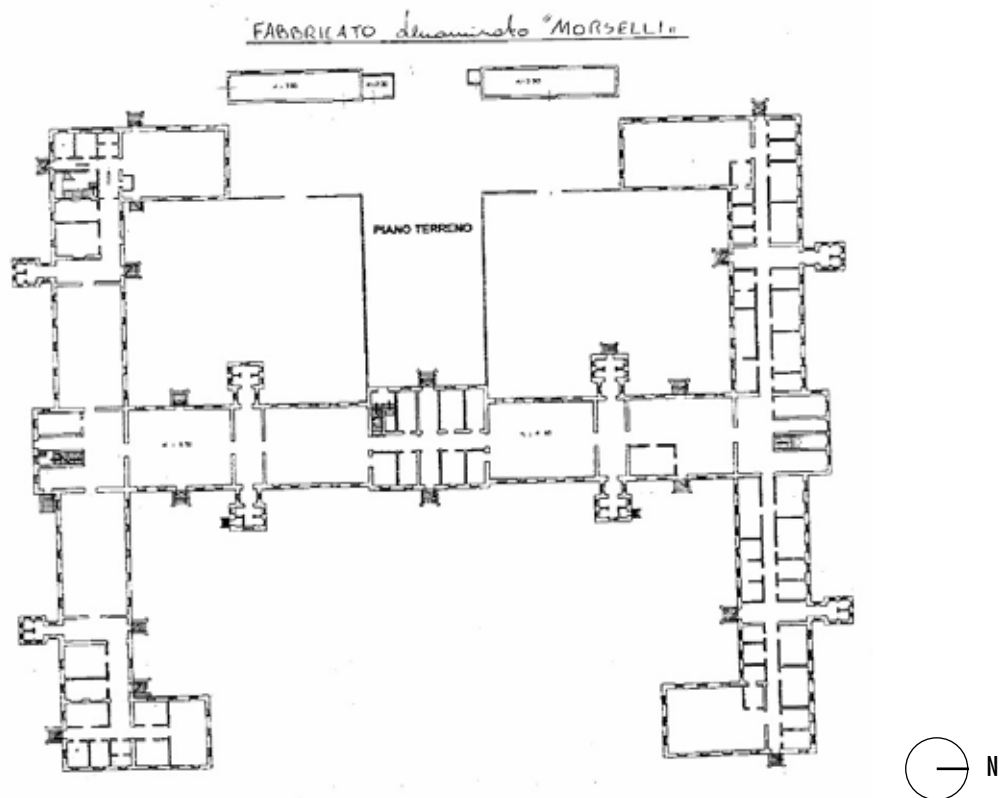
Ground floor plan of the Morselli Pavilion, current status.
